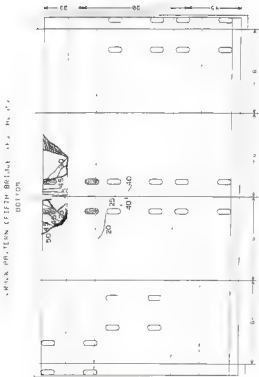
Bottom Cracking Pattern (Fifth Bridge - Test No 2)
